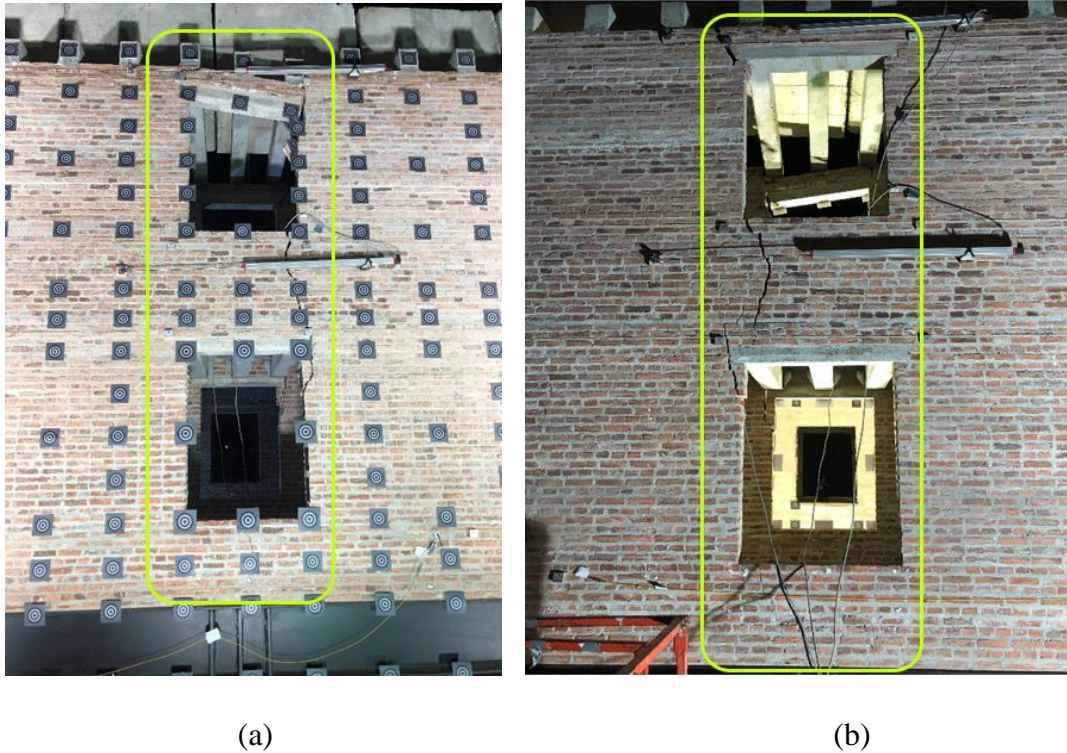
Observed cracks after Test 4: (a) at the front wall of the joist floor specimen and (b) at the back wall of the joist floor specimen.
